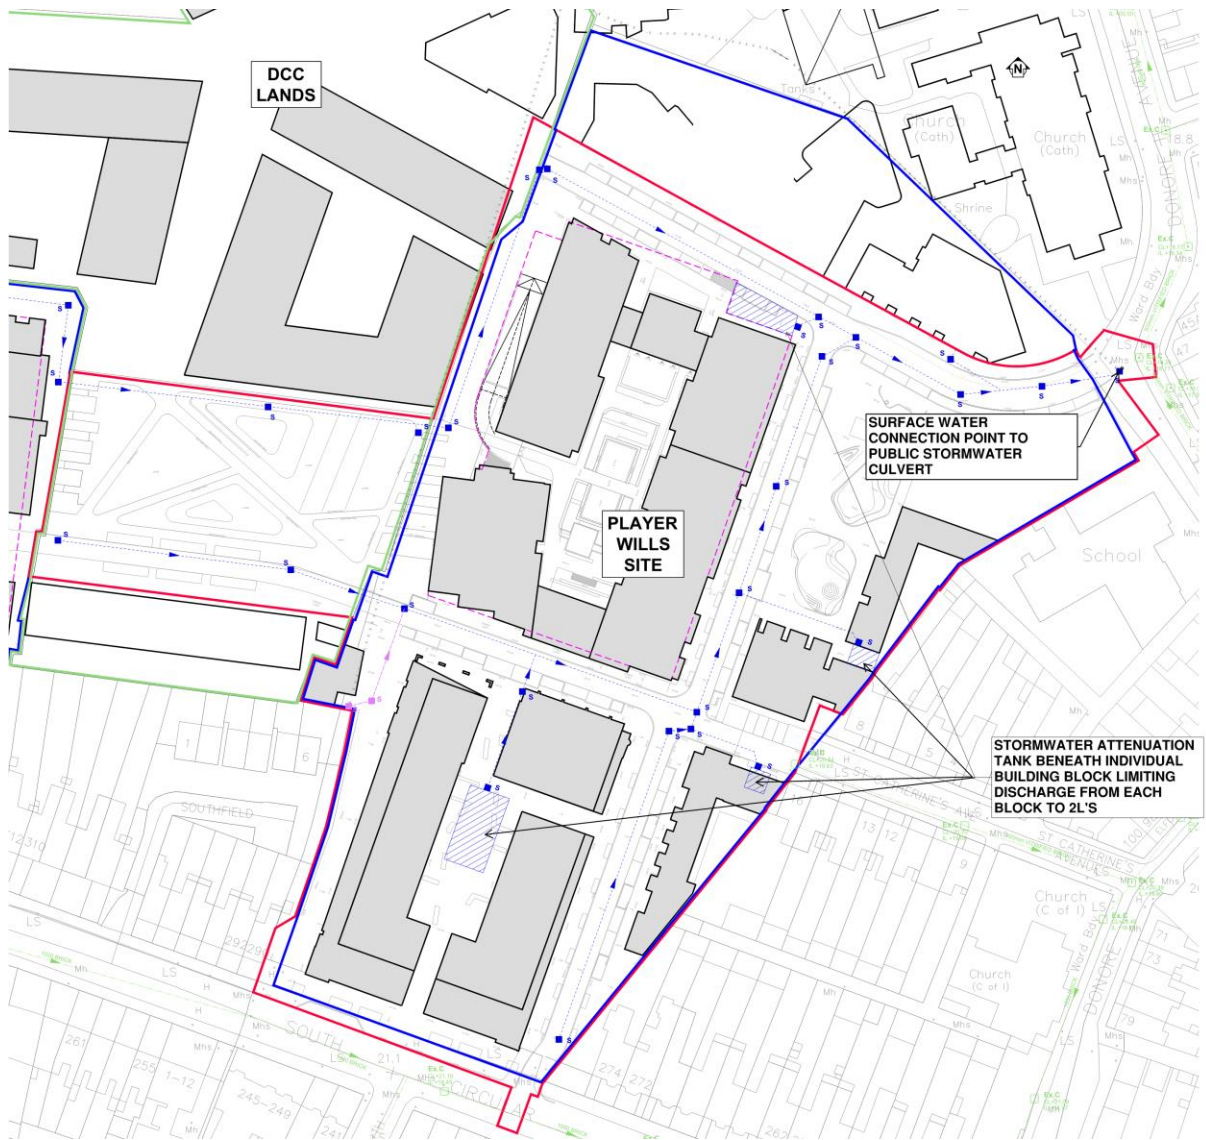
PROPOSED SURFACE WATER DRAINAGE
